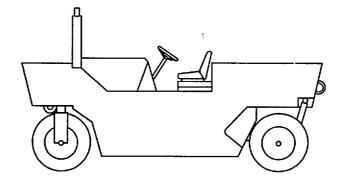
Pneumatic-tyre roller with rigid frame and yoke-mounted steering
